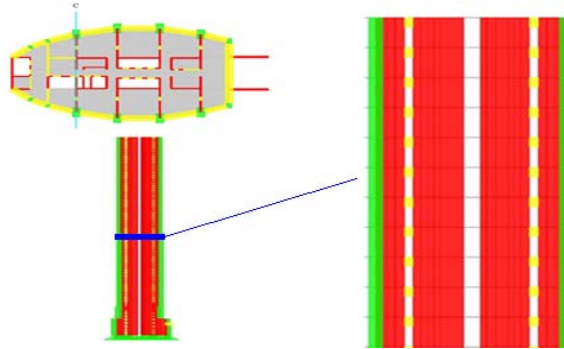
ETABS Model Coupled Direction Elevation View (C)
